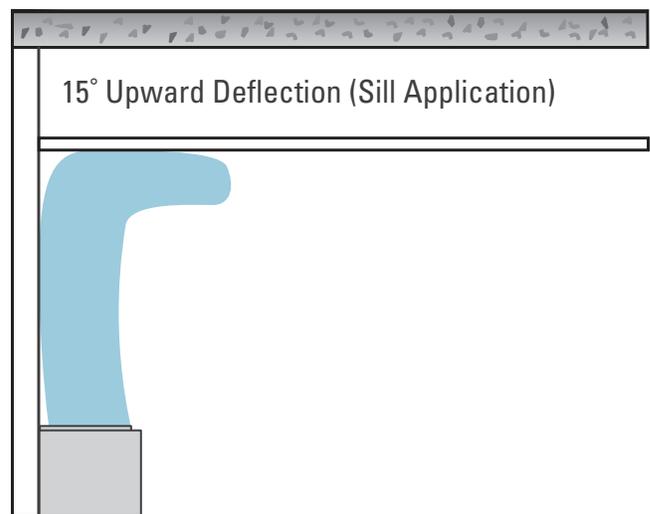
Floor Mounted or Sill Mounted Grill Discharging Vertically Upwards
